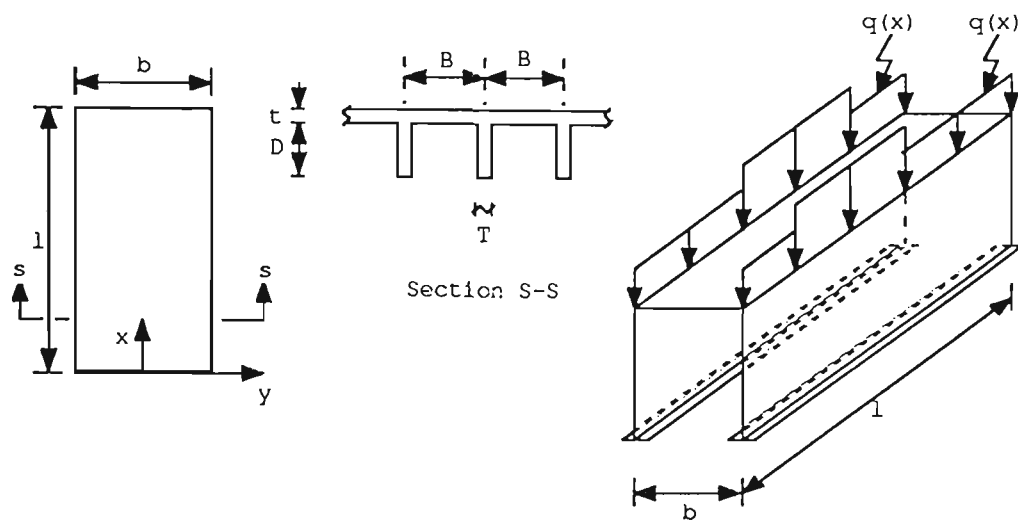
Girder plan view showing flange dimensions and axis. The longitudinal stiffener dimensions are shown (Dowling and Burgan, 1985)
